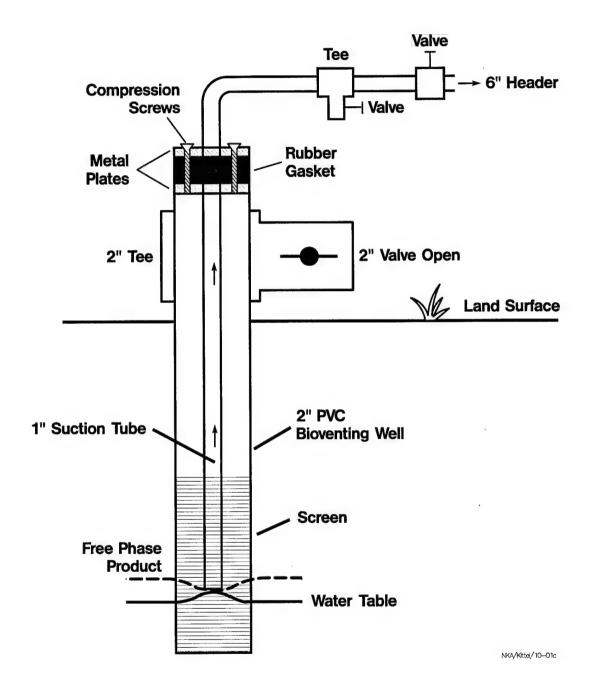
Slurper Tube Placement and Valve Position for the Skimmer Pump Test
